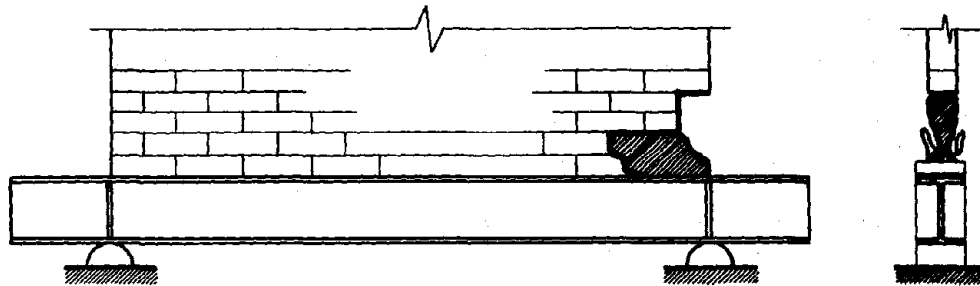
WALL FAILURE ON INTERMEDIATE STEEL BEAM
